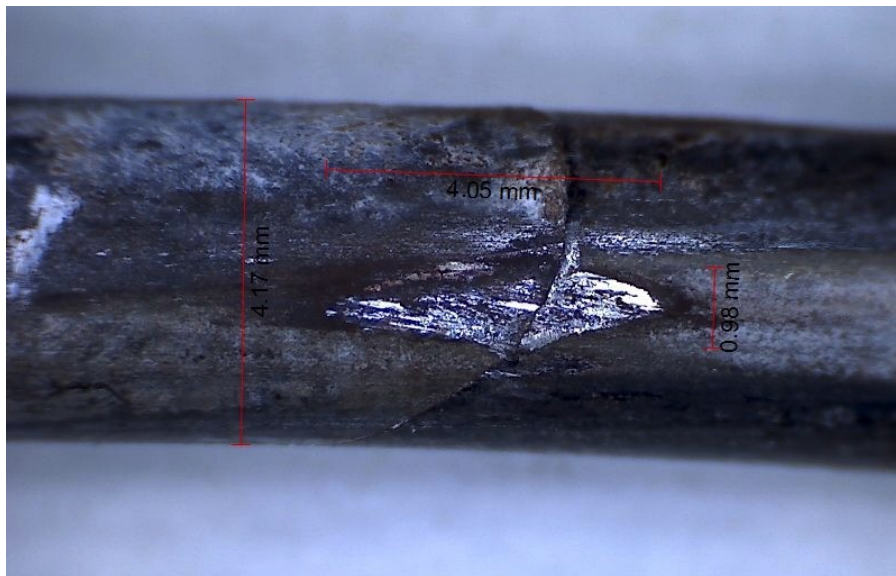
Close-up of concrete-wire fretting damage on an external wire of the 7-wire prestressing strand as extracted from the beam after failure
